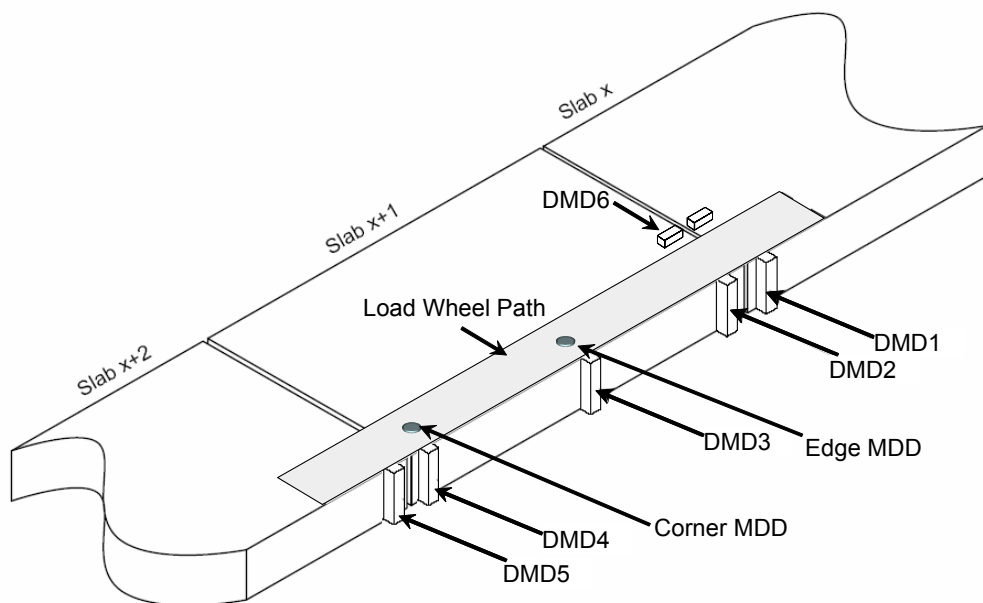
Instrumentation layout of North Tangent test Section 535FD (adapted from du Plessis, 2002B).
